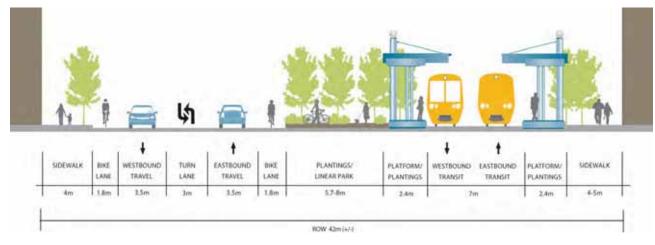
Cross-section for Villiers Street Alternative 3 (facing east)
